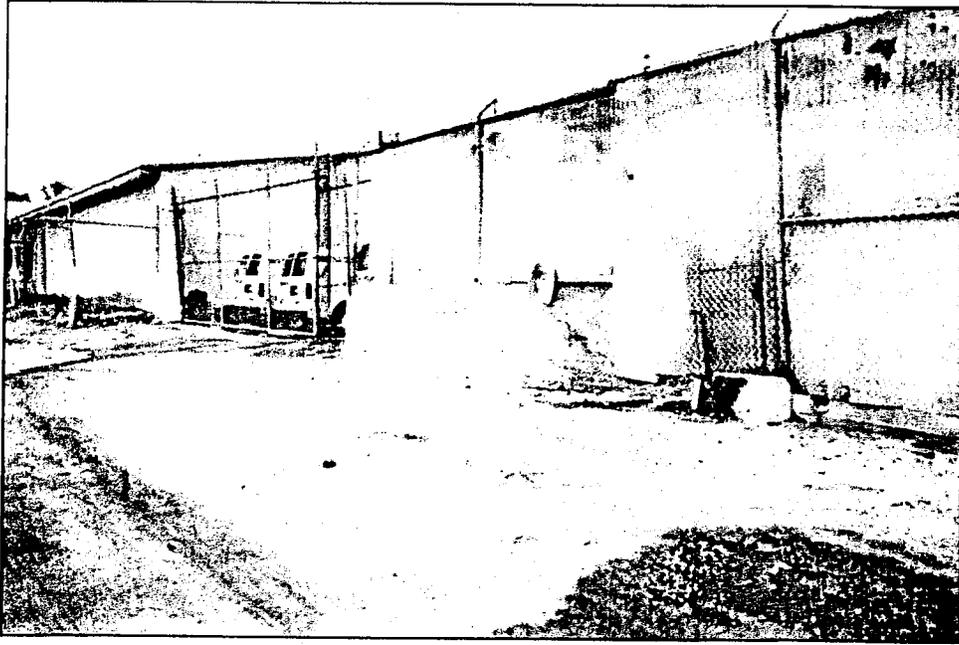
No curbs, gutters or sidewalks at 4600 Worth St.
